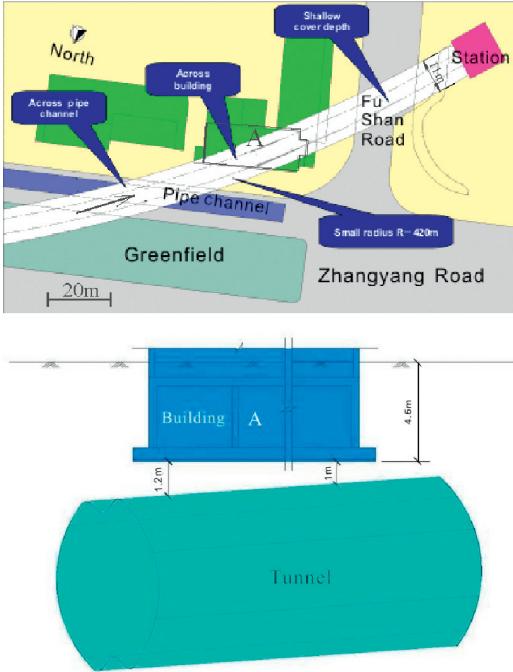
The plan view and transverse section of the double-o-tube shield tunnel crossing building A.
